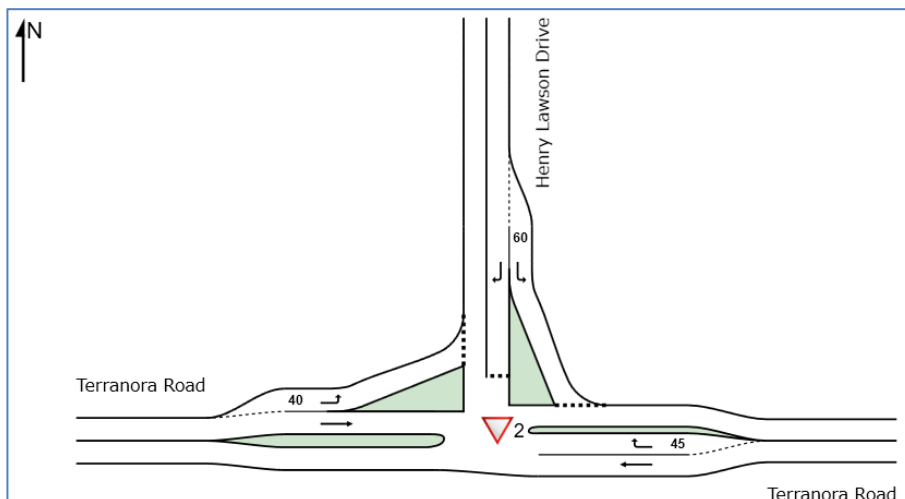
Henry Lawson Drive/Terranora Road Intersection – SIDRA Layout
